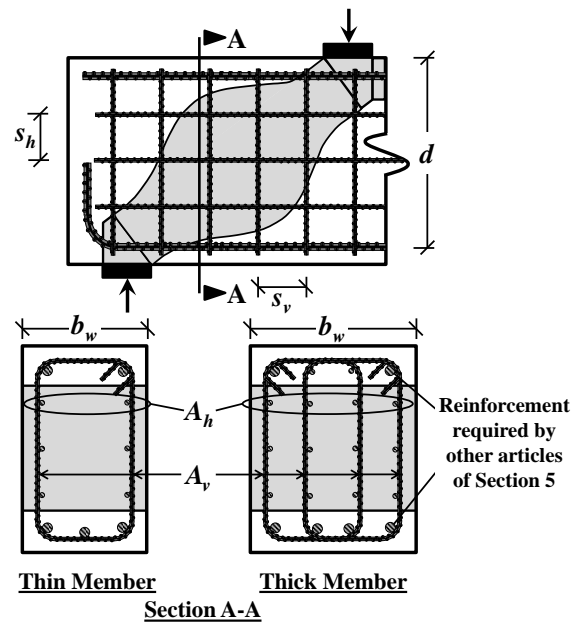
Distribution of Crack Control Reinforcement in Compression Strut
